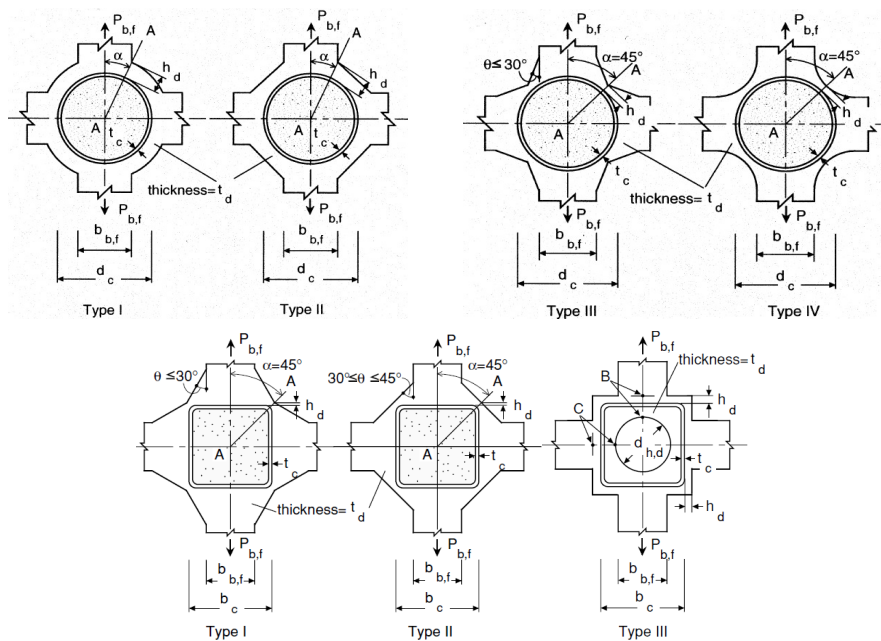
Connections with external diaphragms to concrete-filled hollow sections [51] [52]
